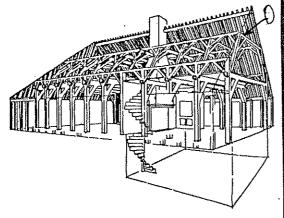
Reconstructed perspective of a farmhouse built by Jeuriaen Hendricksz for Jan Damen, 1648.
